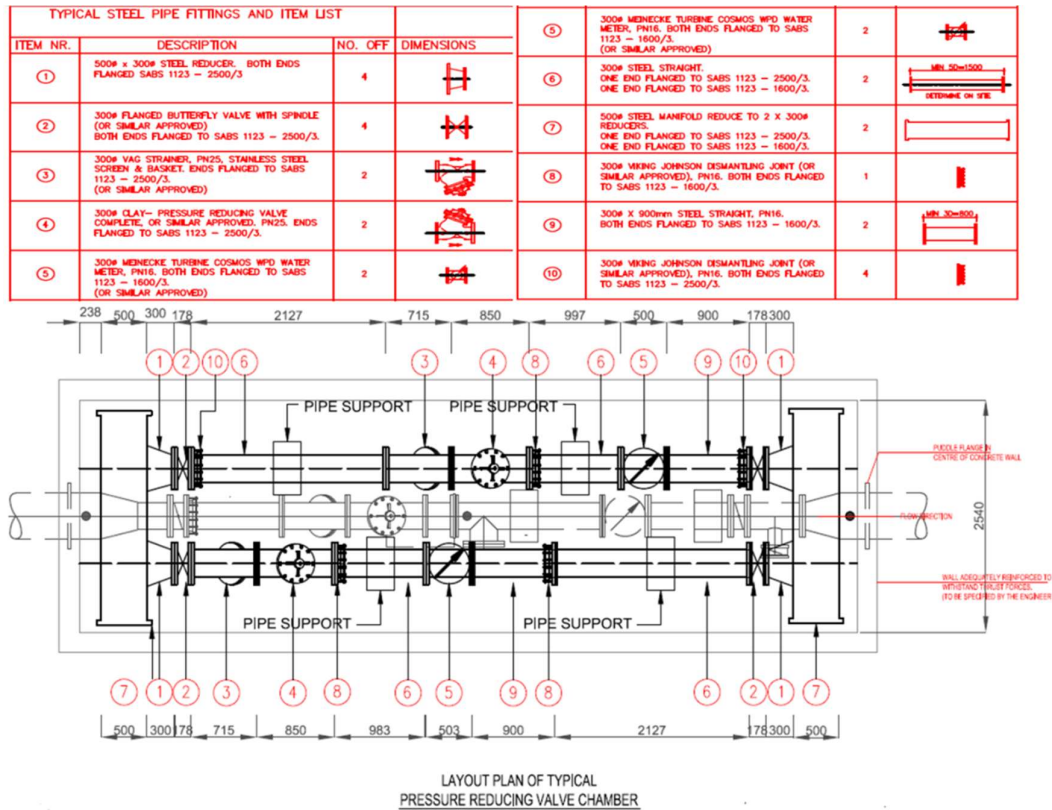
Pierre van Ryneveld pressure-reducing valve chamber layout
